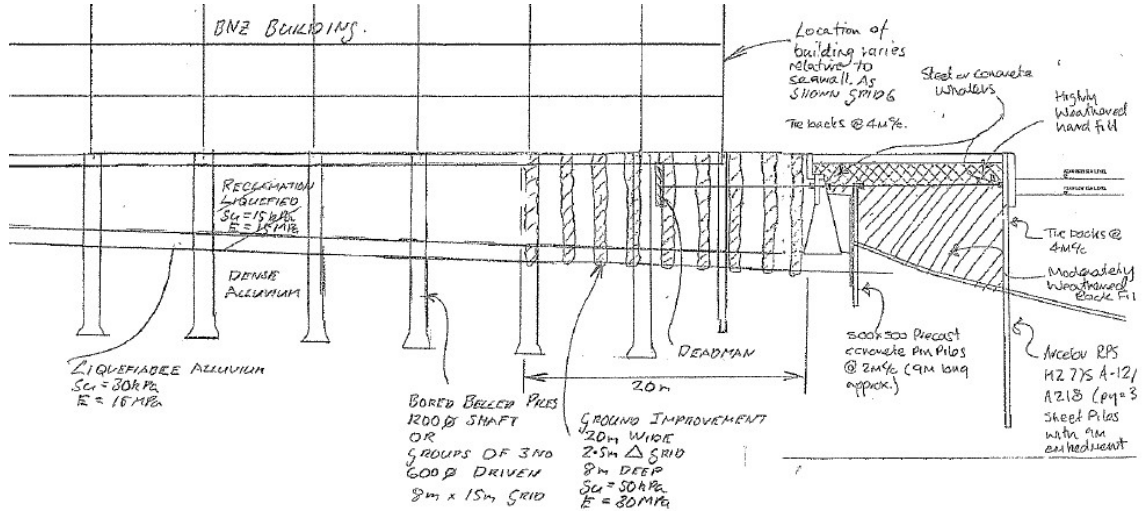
Typical cross section through the site (extract from 2006 T&T report[5])
